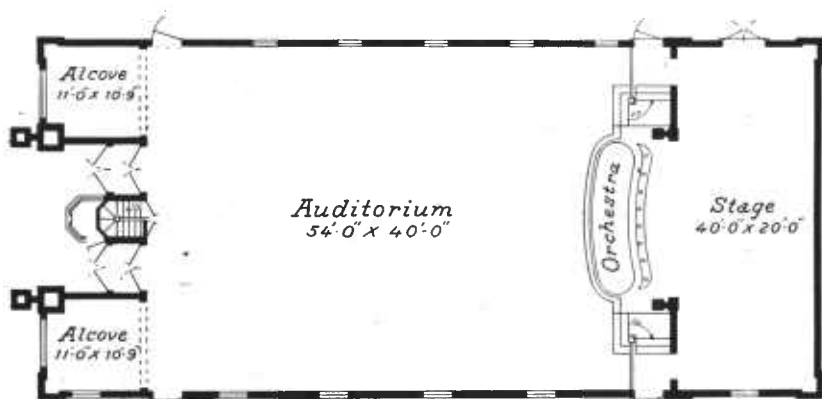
Plan of Centerville building. (By courtesy of E. O. Fullis, architect.)
